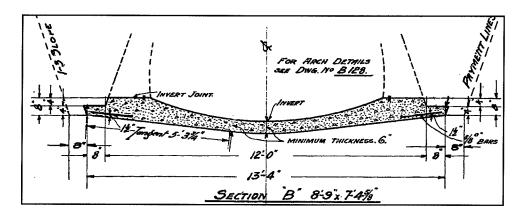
Widened invert slab, used in 1916, to reduce the foundation bearing pressure. This invert type was used on all solid foundations, whether compressible or not. (from GWWD Drawing D-334)
